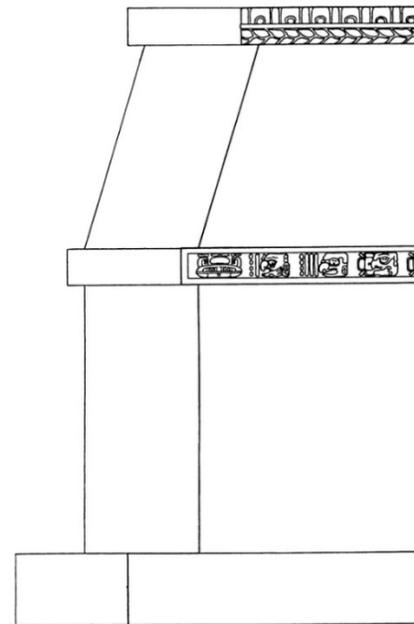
Morley's rendering of the northeast corner profile of Structure 1B-1, showing (bottom to top): foundation platform, lower wall, hieroglyphic cornice (I.S. glyphs added); stuccoed upper register; and leaf-patterned band. A possible roof-comb would have stood above (see Figure 4.3)
